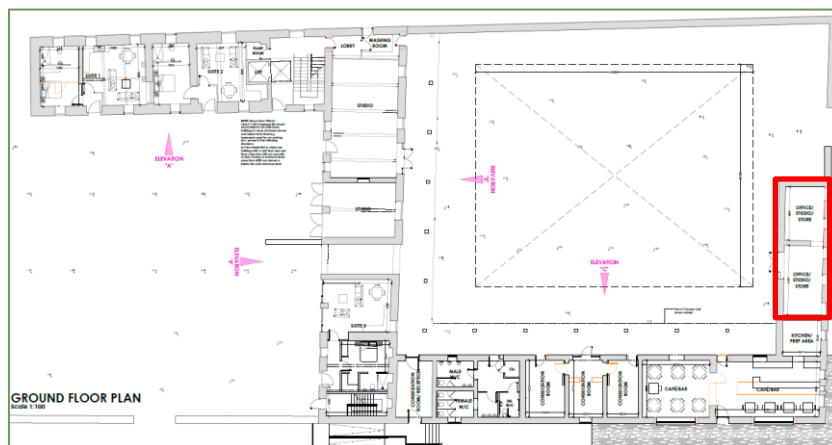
Plan view of former stables with replacement roost attic space shown in red.
